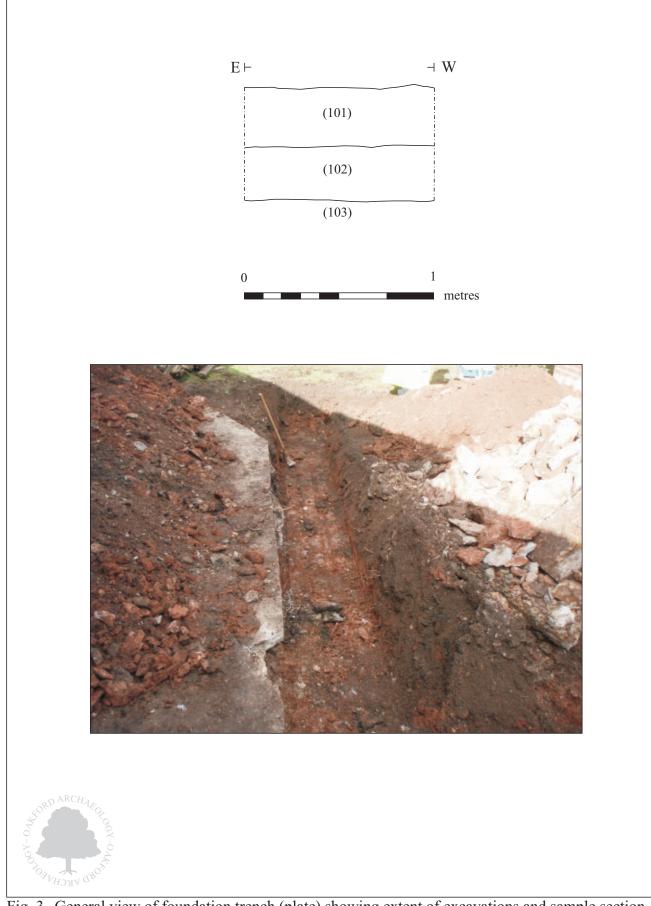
General view of foundation trench (plate) showing extent of excavations and sample section through deposit sequence (above).
